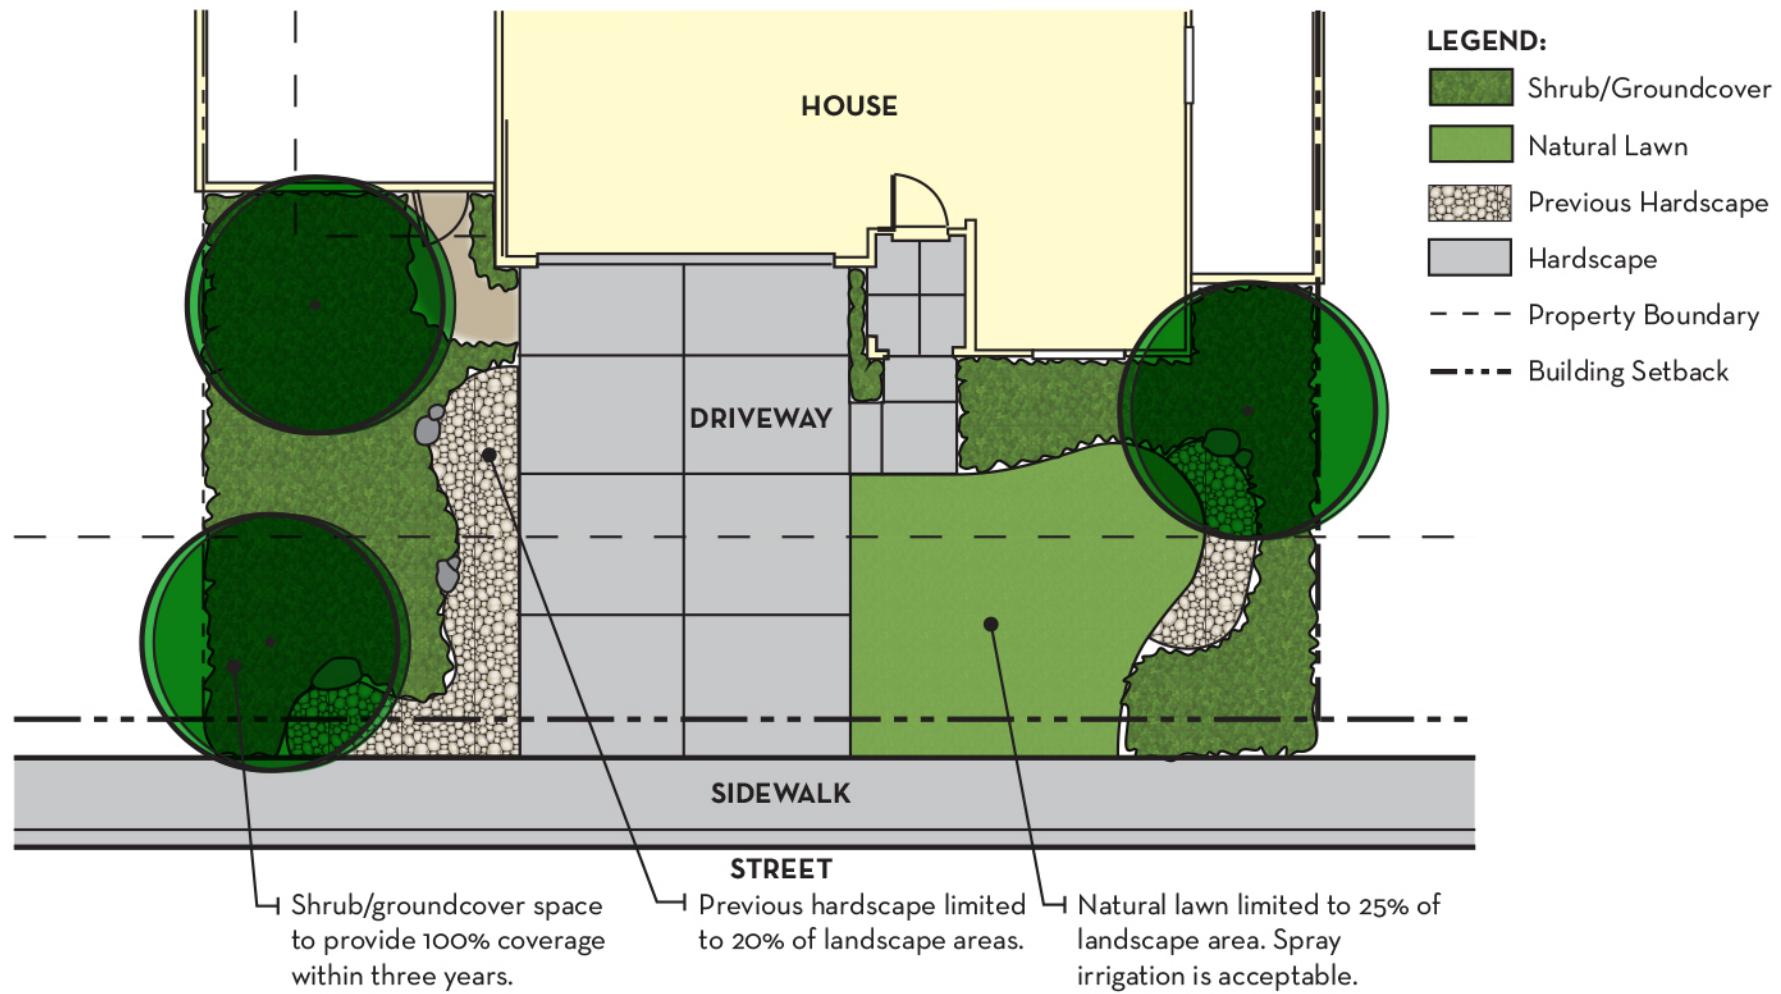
Natural Lawn and Plants Conceptual Landscape Plan
